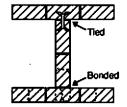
Connections between cross rib and leaves for diaphragm wall.
